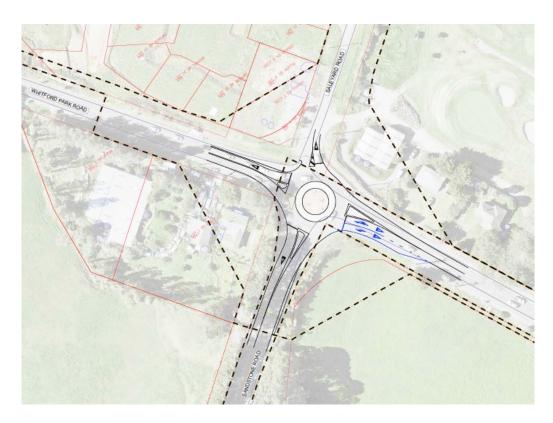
Proposed Upgrade to Whitford Park Road / Sandstone Road / Saleyard Road roundabout
